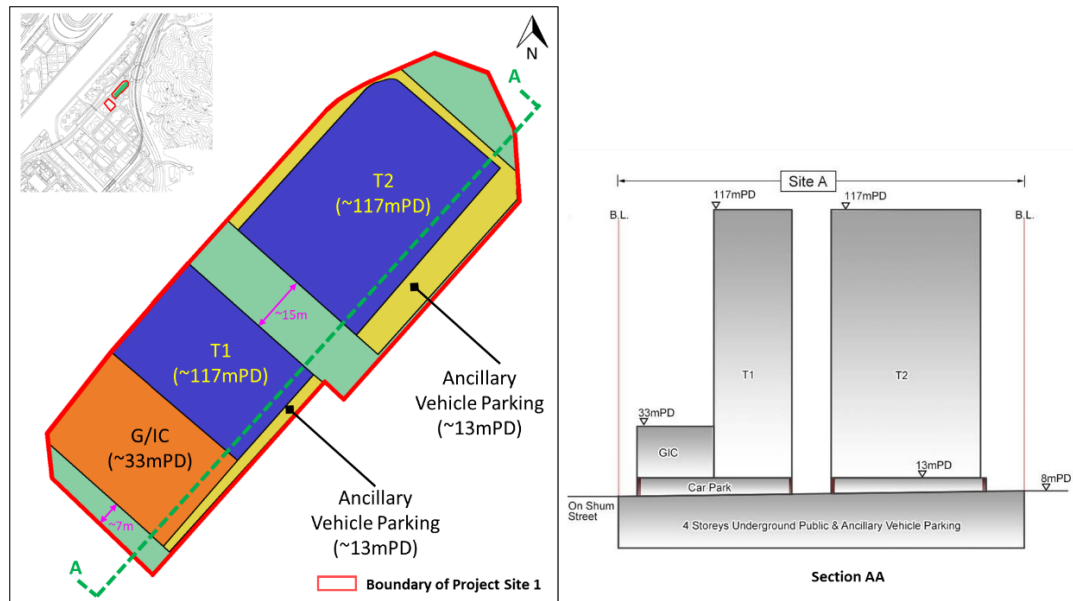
(a) Indicative Development Layout and Cut Section within Project Site 1
